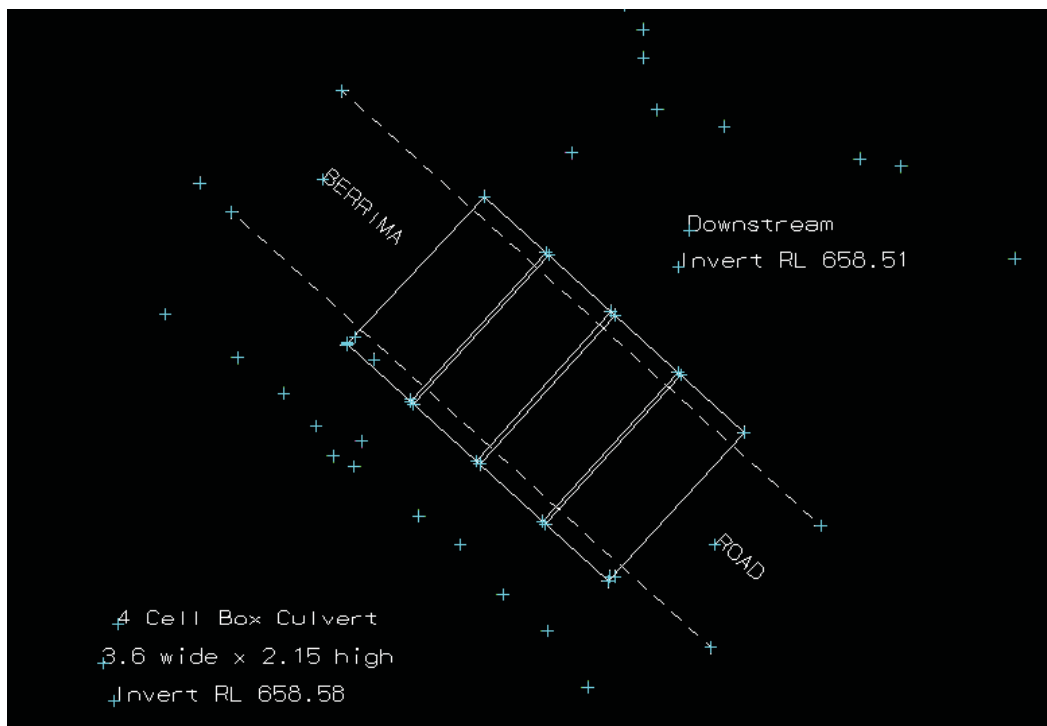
Cad drawing of culvert structure under Berrima Road
